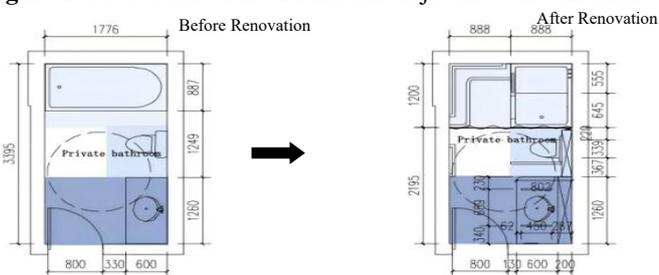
Floor Plan of the Master Bedroom En-Suite Bathroom
